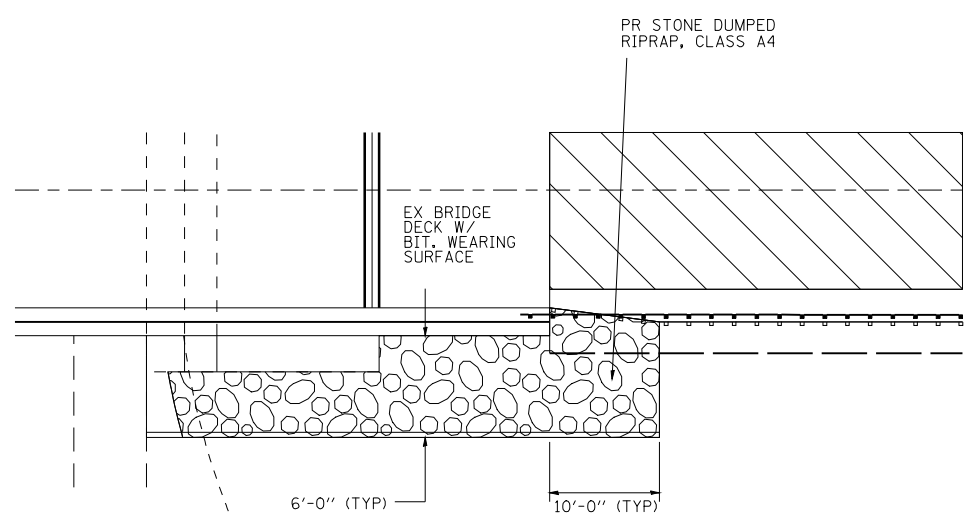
DETAIL OF BENCH OUTLET AND RIPRAP OUTLET SLOPE
